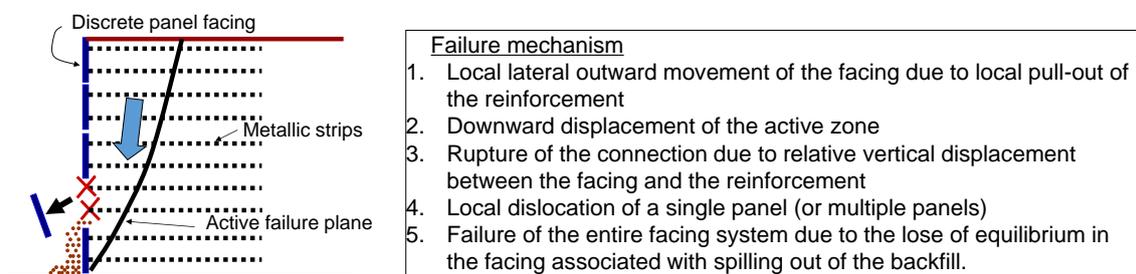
A typical failure mode of steel strip-reinforced soil RW having a discrete panel facing.
